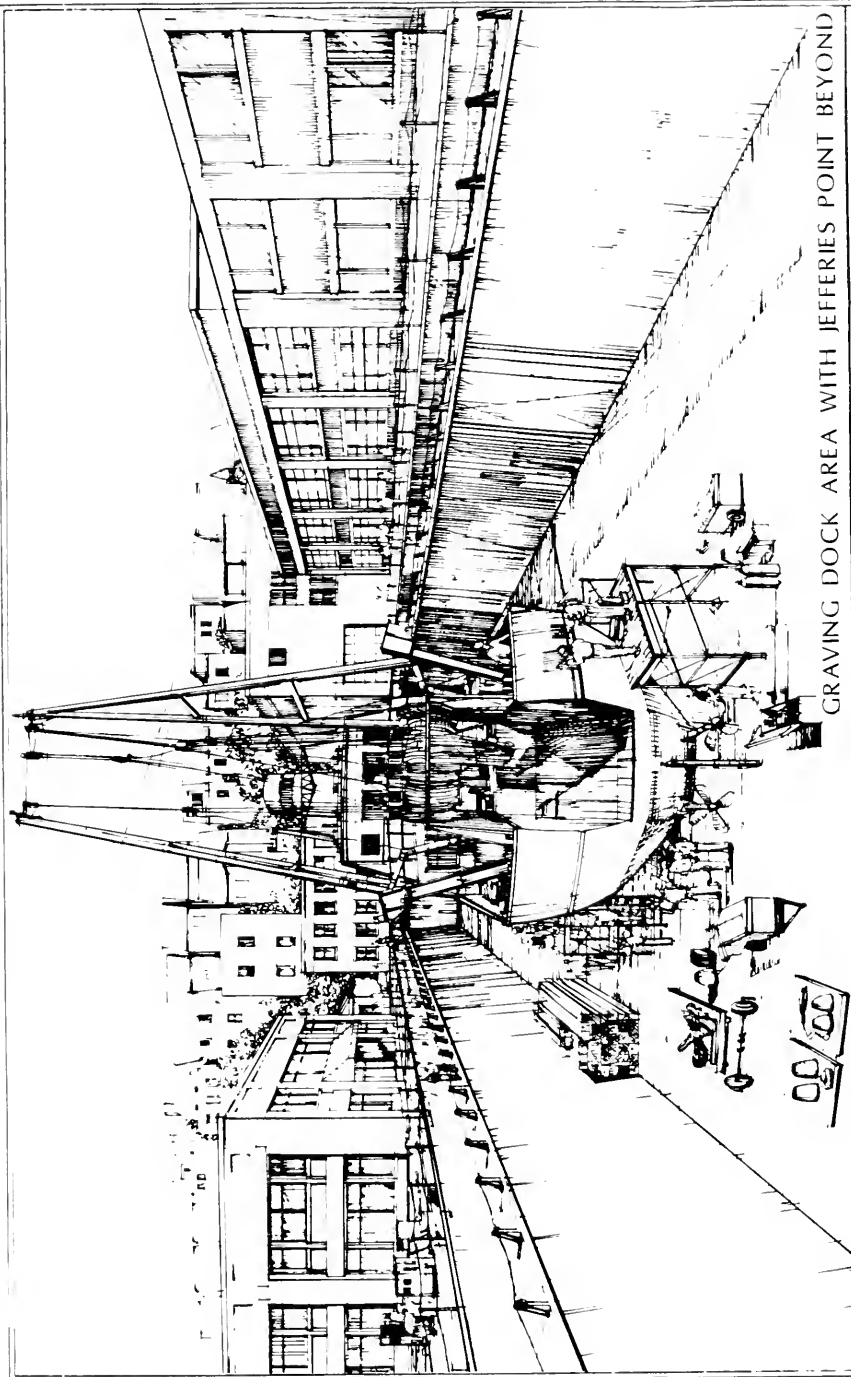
ELEVATION OF THE GRAVING DOCK
